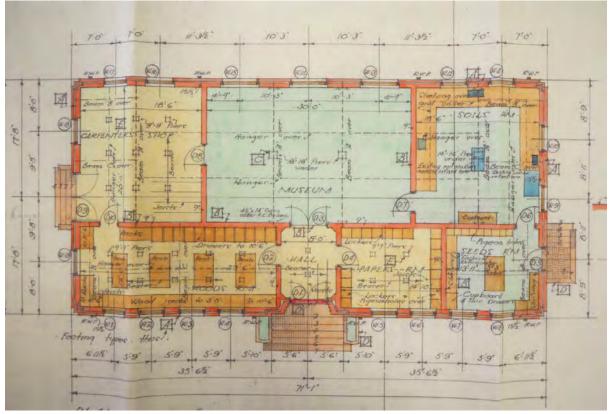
Museum building floor plan, details of Wood, Seeds and Papers Rooms (NAA #7689917)
